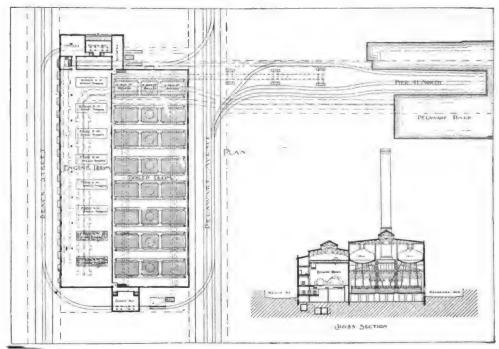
DELAWARE AVENUE STATION-PLAN AND ELEVATION.
